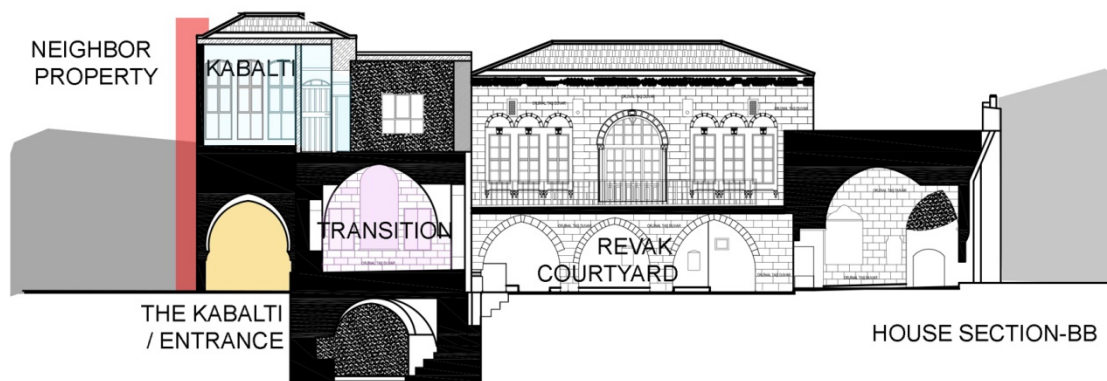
The section and elevation of Ibrahim Halil Gungur Kabaltı House
